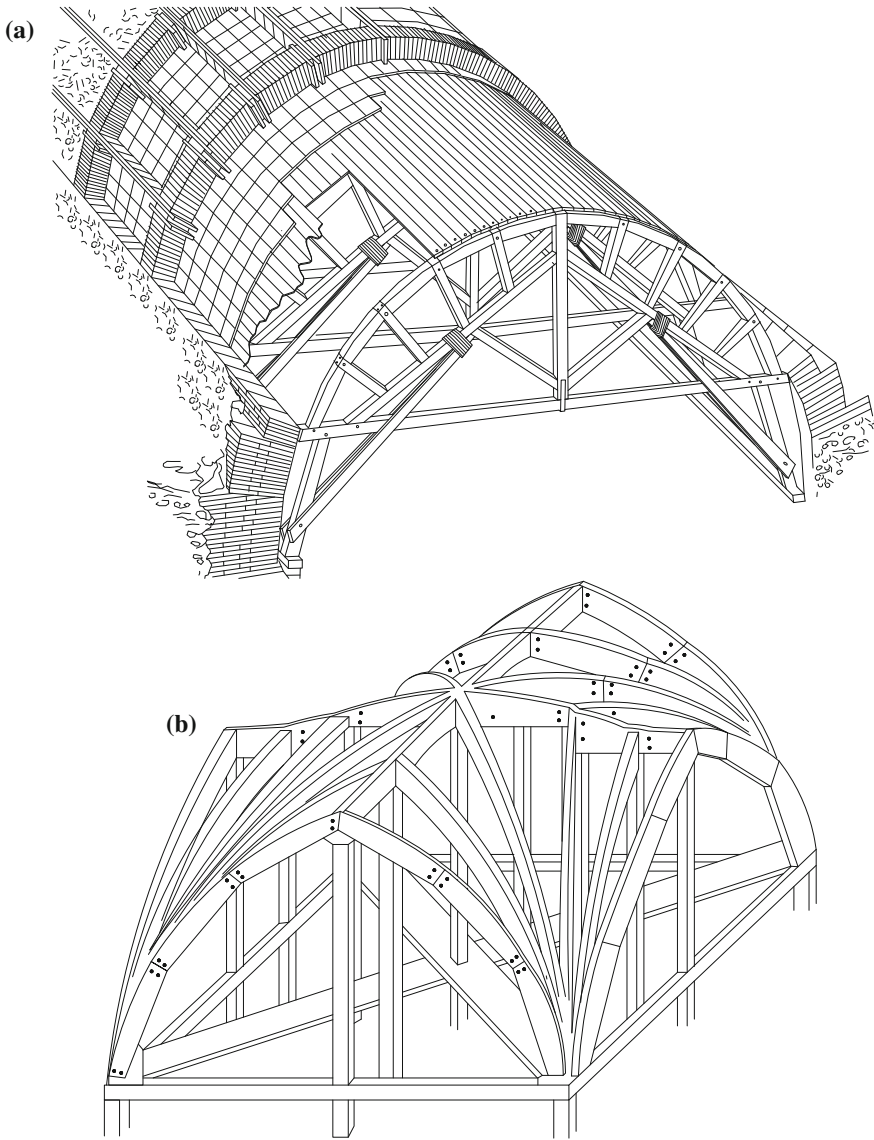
Scaffoldings for the building of vaults, a masonry cylindrical vault [1], b masonry cross vault according to [2]
